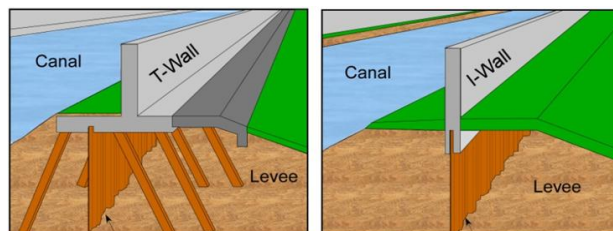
Cross Section of I-Wall and T-Wall (Nelson 2012)
